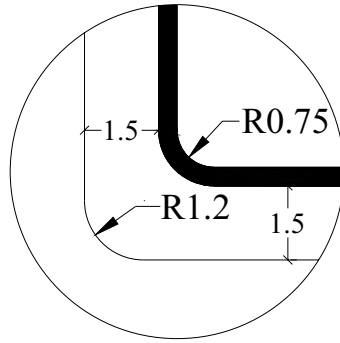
Chamfer Detail for the Corners of all the Prismatic Specimens
